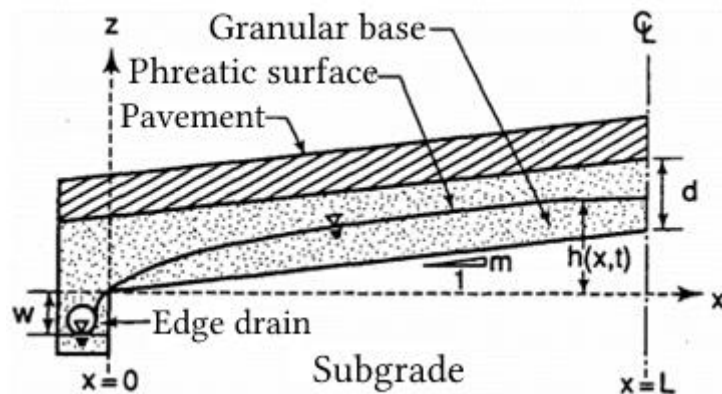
Cross section of pavement structure, from McEnroe (1994)
